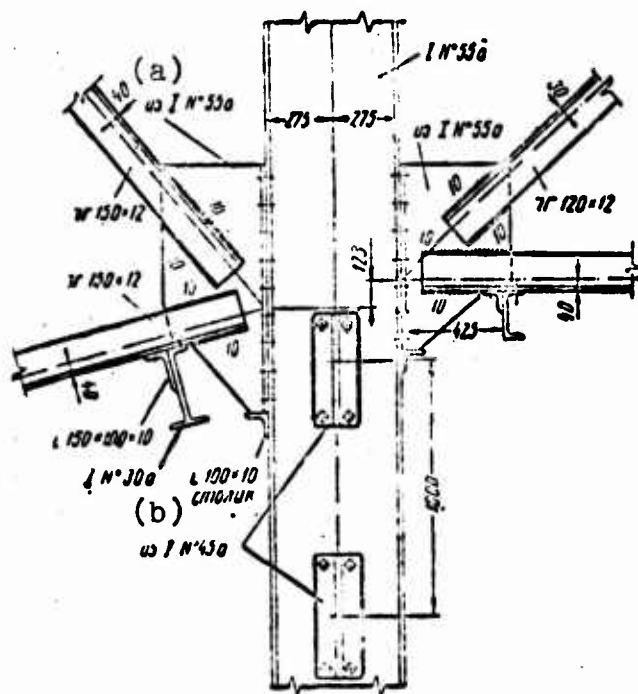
Subassembly at the junction of the inclined and horizontal sections of the gallery.
